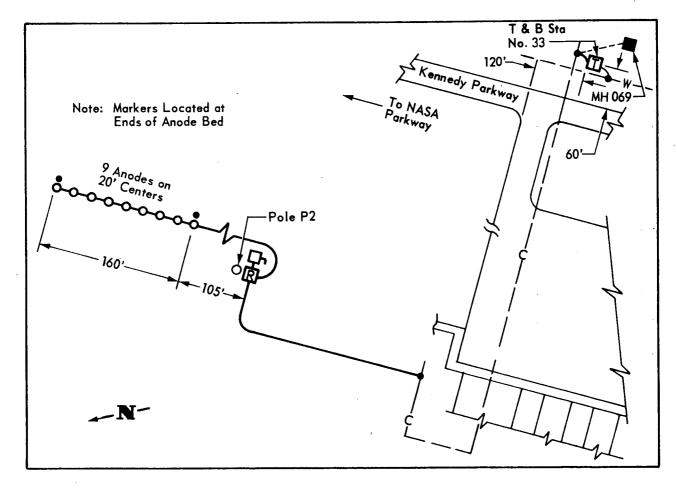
Site No. 37 and Test and Bond Station No. 33
